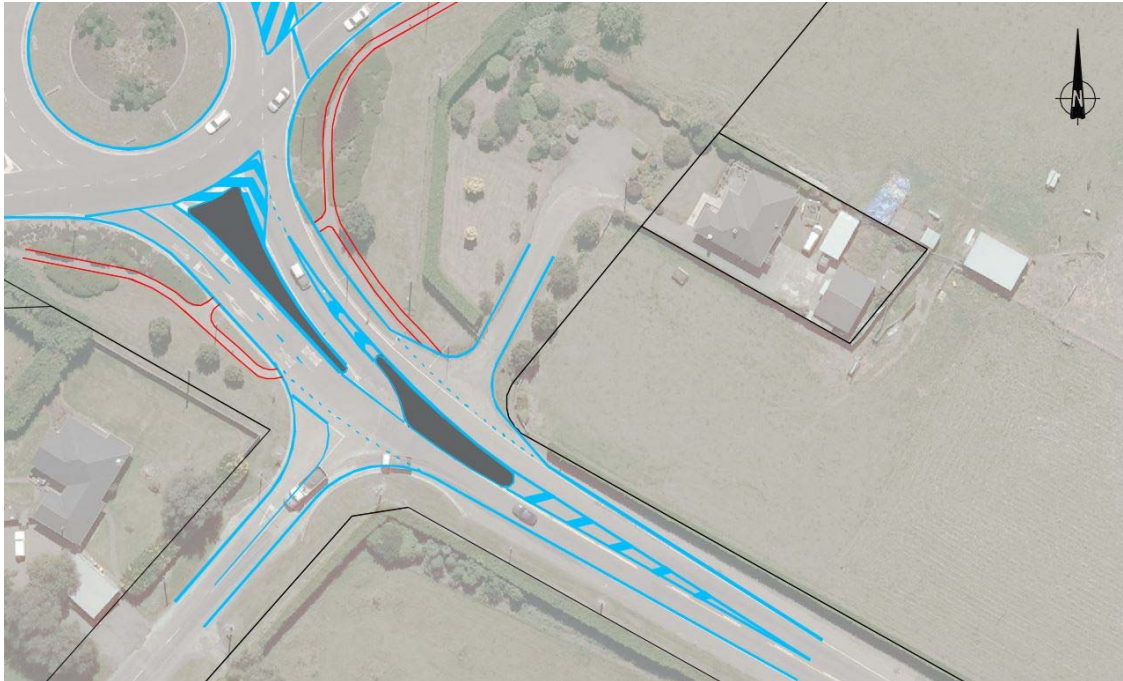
Proposed Right Turn Layout at Sawyers Arms Road / Waimakariri Road Intersection
